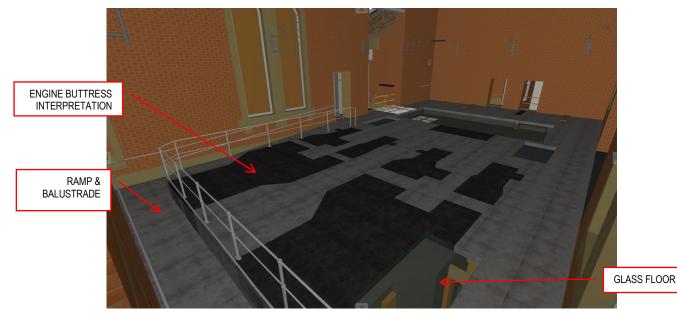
Proposed CHEH Engine Room, perspective view looking east, 3D Architectural Model. (Colours/materials in the image are not indicative of reality). The level floor structure with in-built conduits for future services allows flexibility for many uses.
